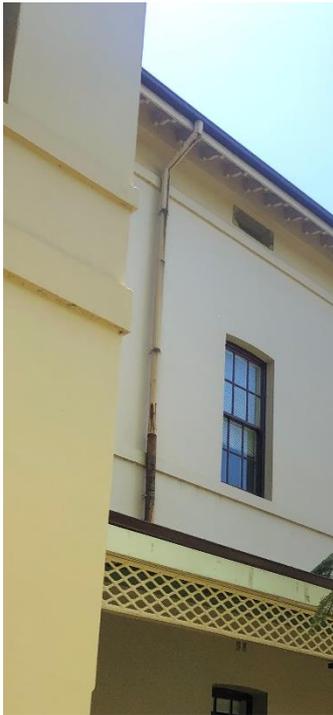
Downpipe located on east side of unit 135 showing heavy corrosion and detachment from gutter.
